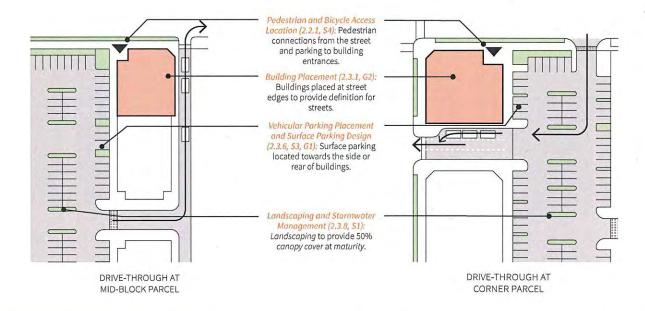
Drive-Through outside General Plan Growth Areas - Comparison of drive-throughs outside General Plan Growth Areas at a corner parcel and at an internal parcel. Both maintain direct pedestrian access from the sidewalk by locating the building in the front corner of the site and minimizing curb cuts and driveways. Drive-throughs are not allowed within Growth Areas and designated Urban Villages.
